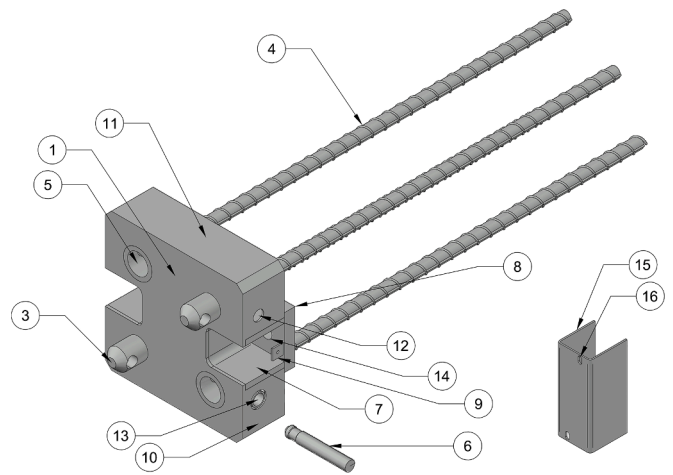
Isometric view of 270-mm NTNU DEP joint.
